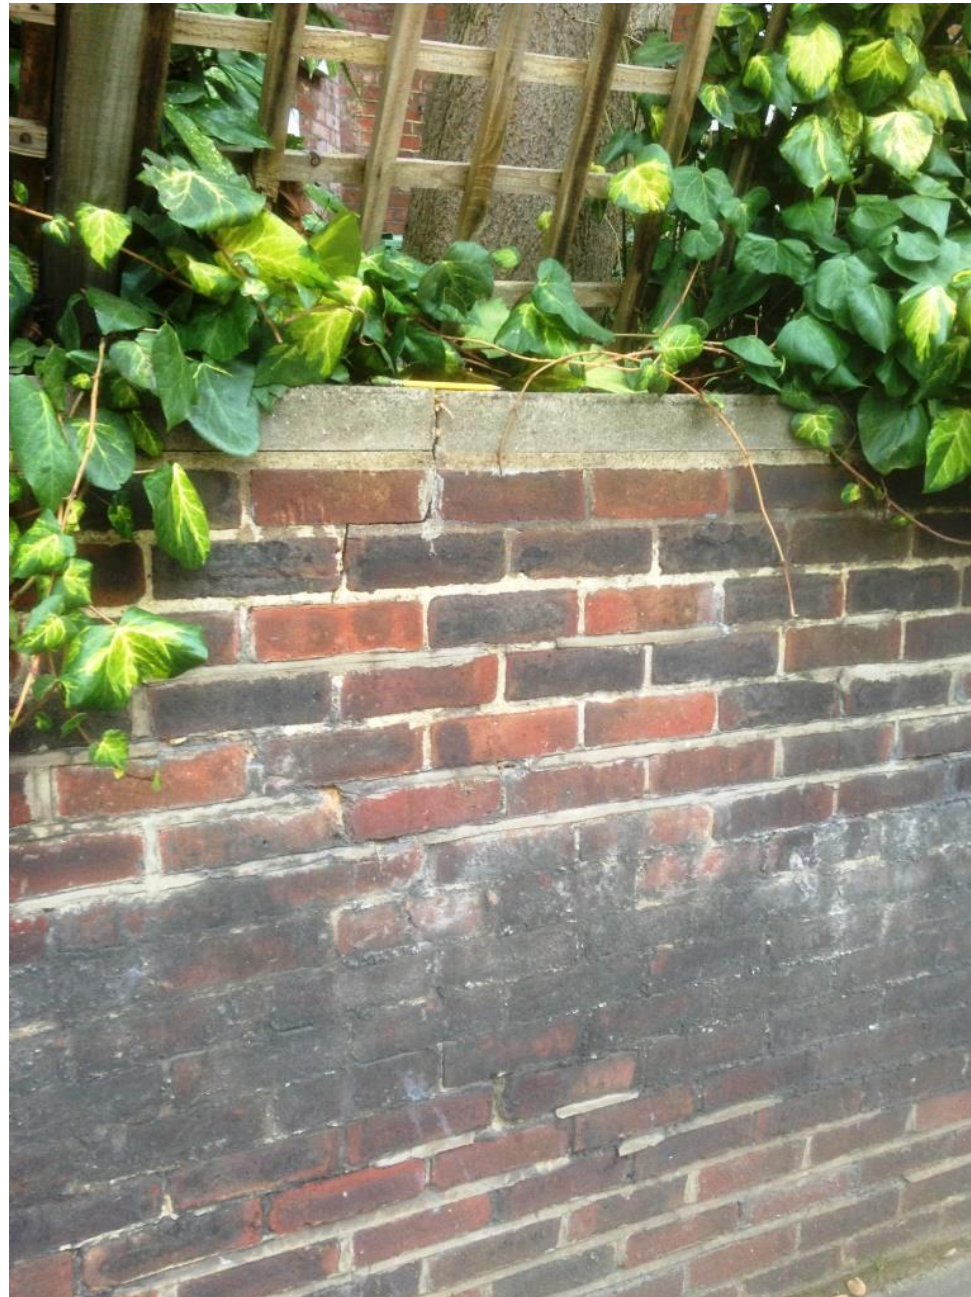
to show wall cracking (2) adjacent to Norway maple T2 (trunk visible). Note yellow pencil for scale.
